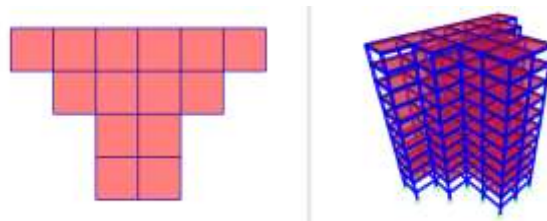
Plan and 3D view of T shape G+9 building in SAP2000
